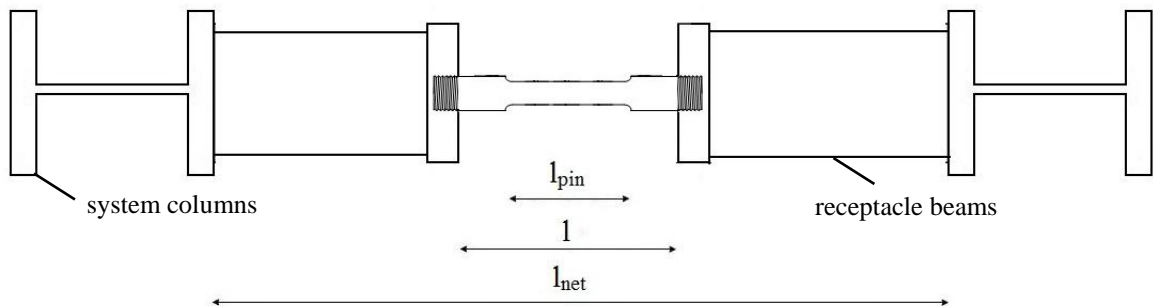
Typical plan view and dimensions of FUSEIS pin link system
